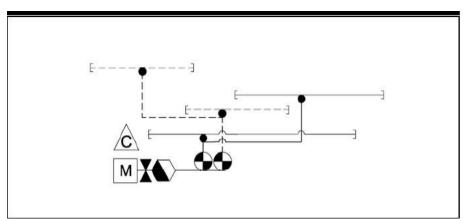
illustrates typical landscape symbols utilized on irrigation plans.
